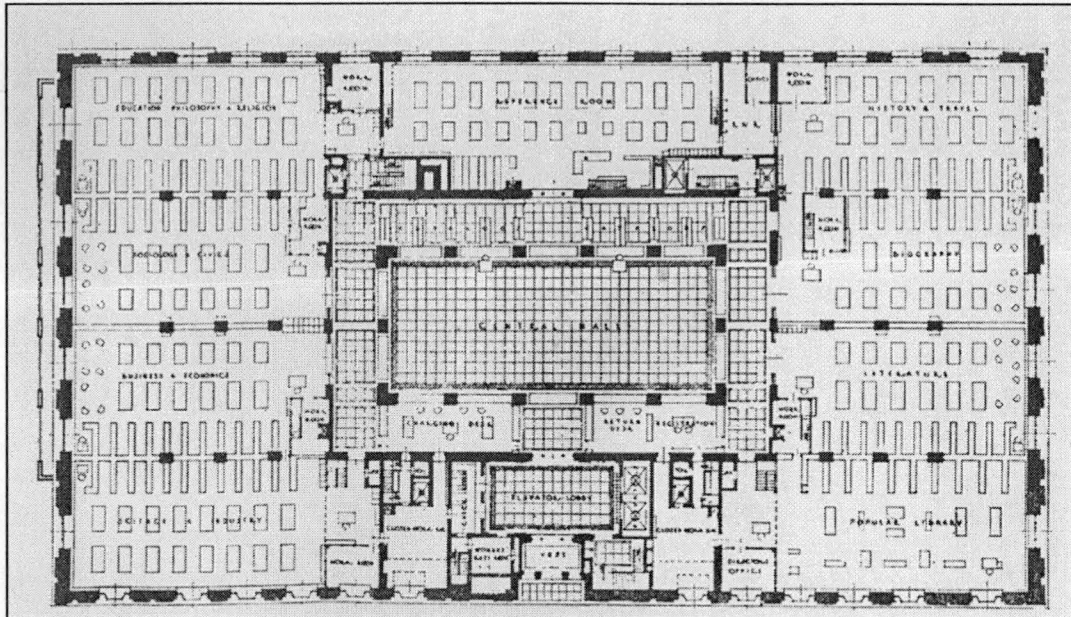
Ground Floor Plan Central Building 1936, courtesy EPFL
